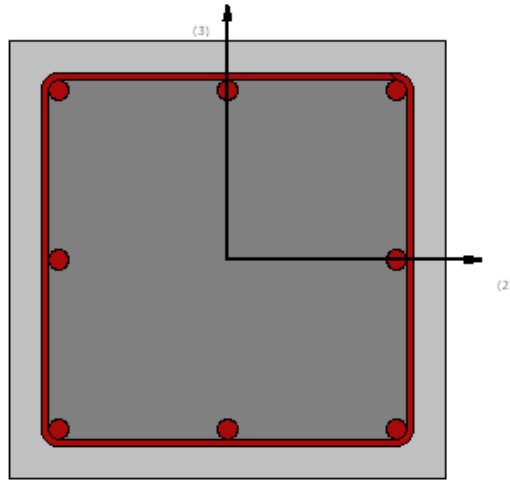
Rectangular Column section 0.35x0.35 (8 No.16) for 4 story building.
